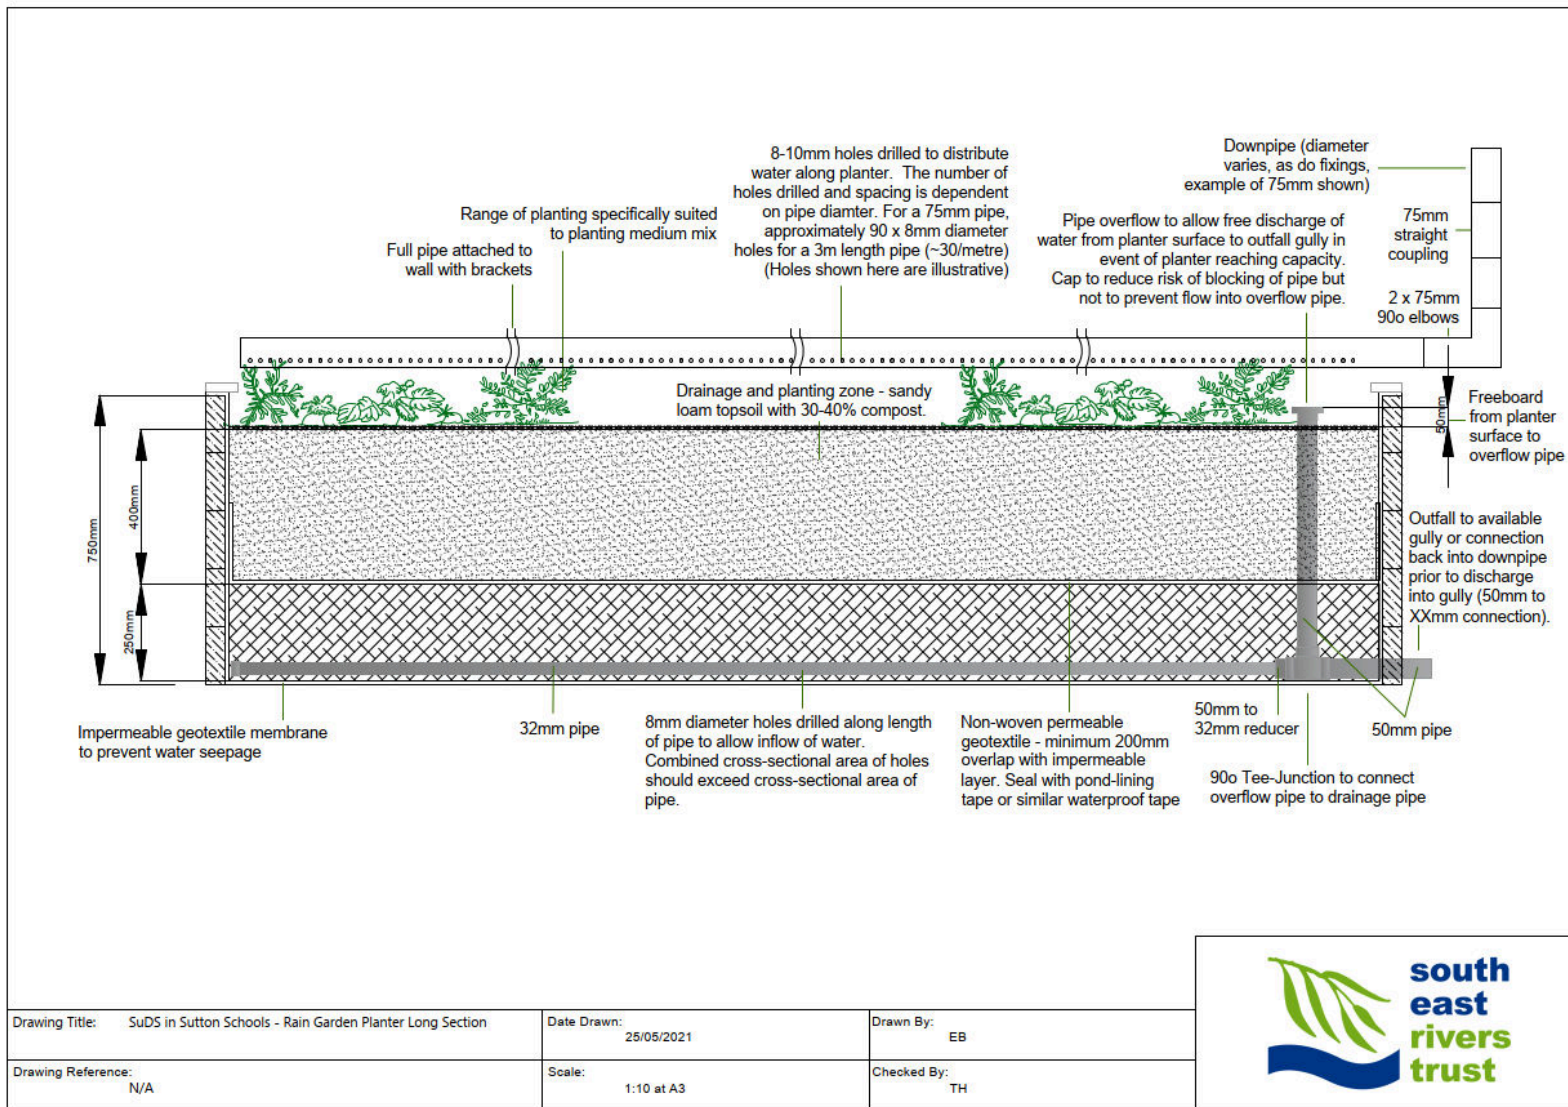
Illustrative Planter Long Section showing external and internal pipework
